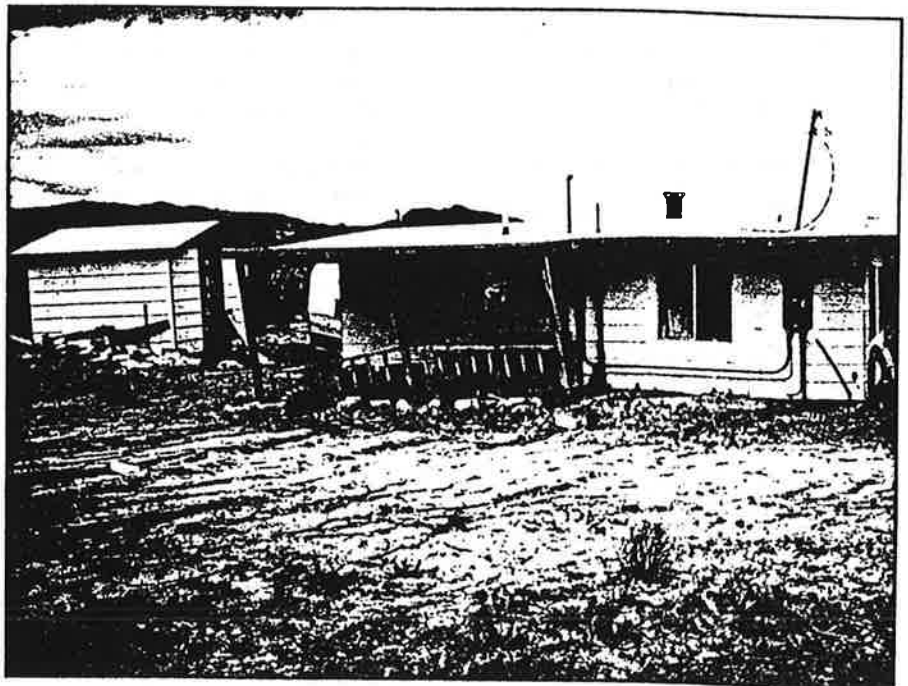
House damaged by Kickapoo Fault. Although main scarp and rupture passes between house and outbuilding, numerous other fissures are distributed over a zone at least 50 feet (15 m) wide. Much of the subsidiary rupture was diverted around the slab foundation of the house, offsetting the patio slab right-laterally more than 2 feet (less than 1 m) (see Photo 4). Photo by E.W. Hart.
